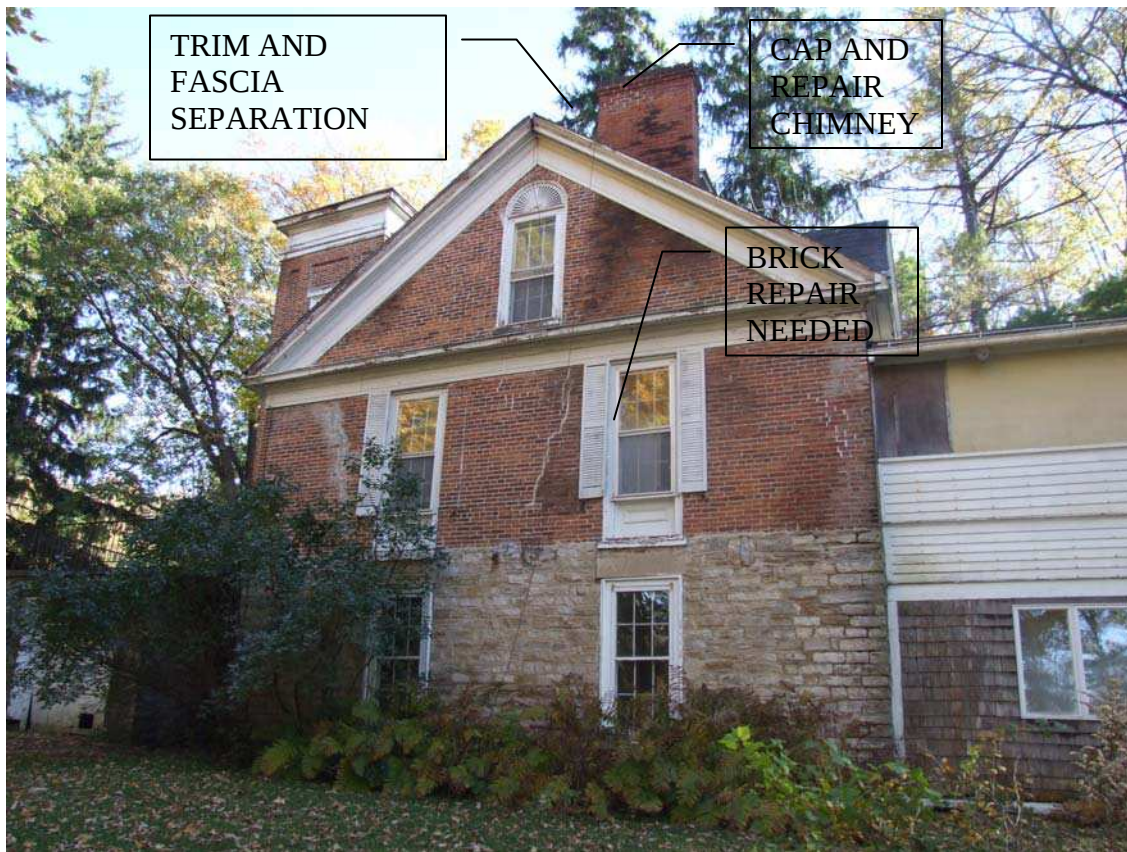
North wall showing exterior (see lower level floor plan for photo vantage point).
